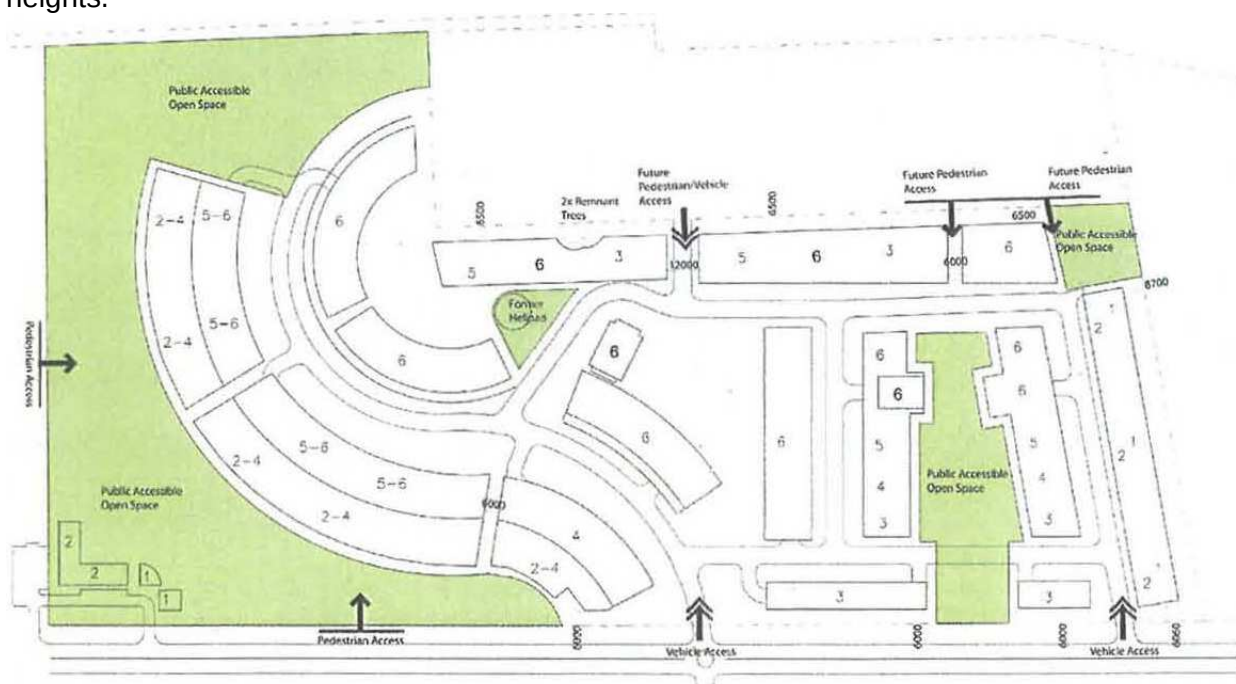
Maximum building height (source: Approved Concept Plan MP 05_0086, as Modified)
